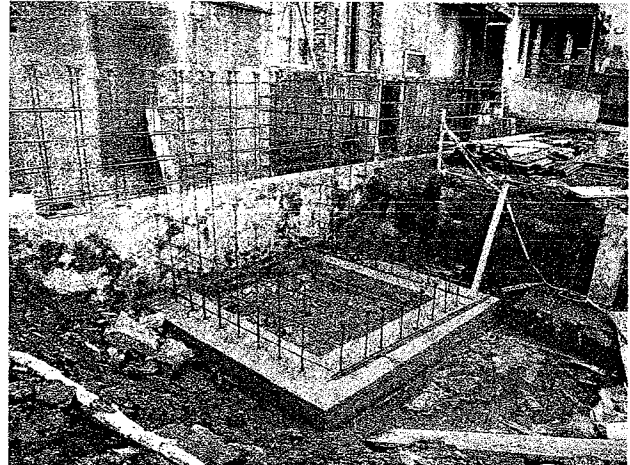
Reinf. @ rear sidewalk / stair (looking south)
